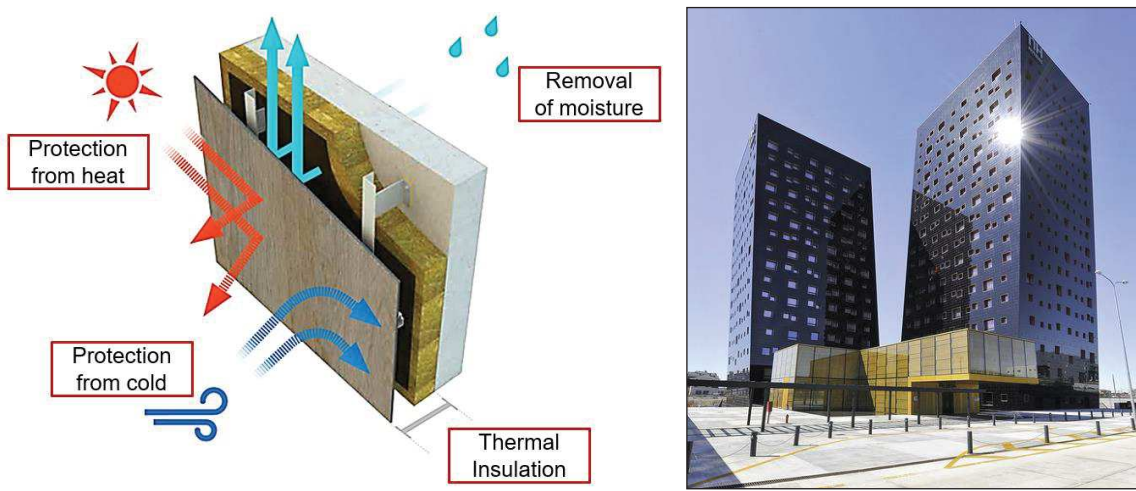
Concept of ventilated facade system (left) and on-site application (NH Hotel Tower, Polo di Rho Pero – Milan, Italy, Architect: Dominique Perrault Architecture).
